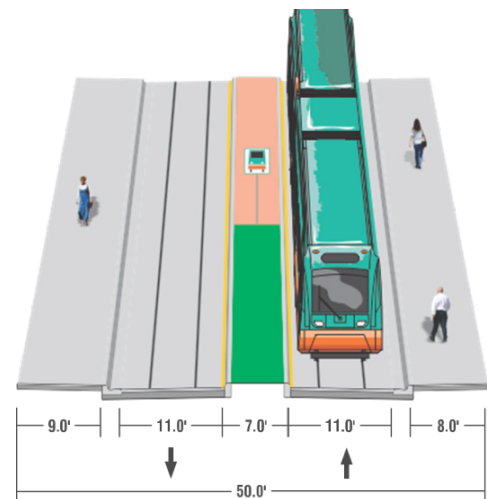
NE/NW 2ND STREET – TRANSIT MALL/TRANSIT ONLY STREET TYPICAL SECTION (DC)
